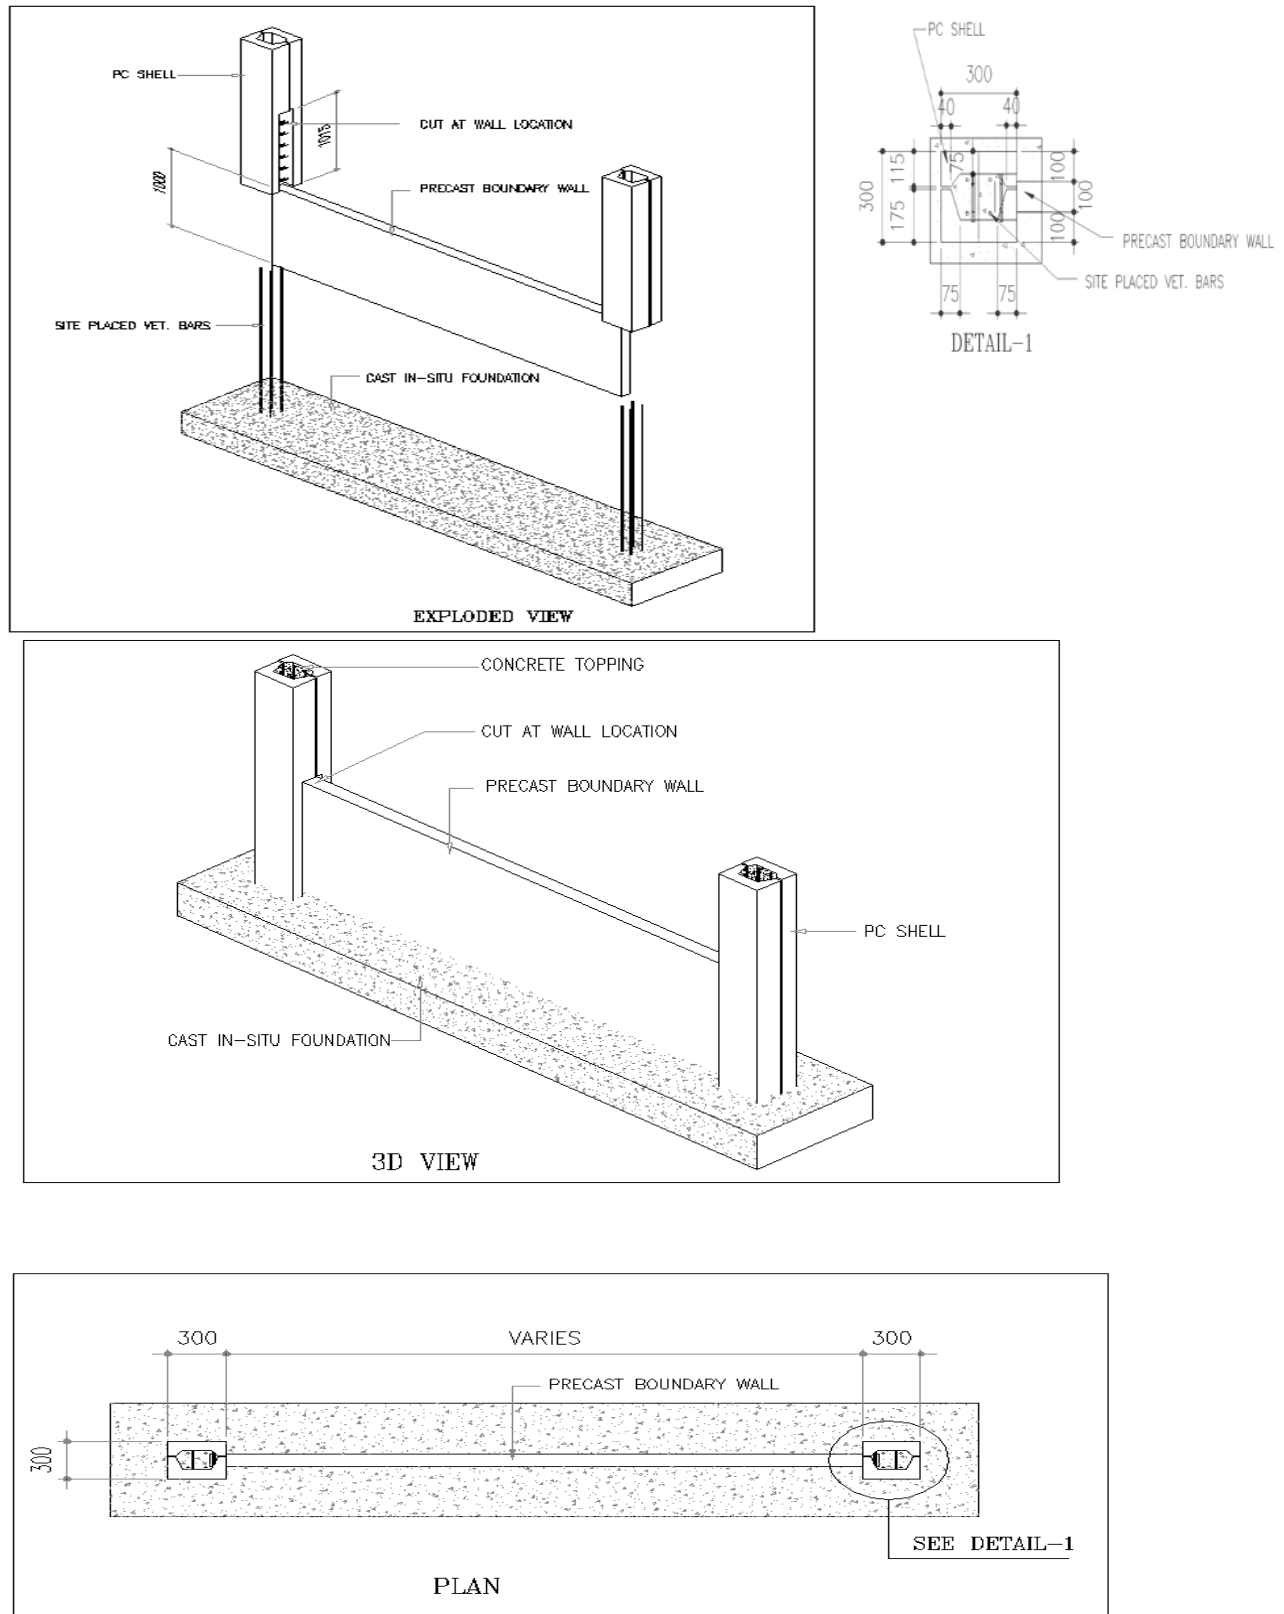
Details of the precast concrete boundary wall (type 1)
